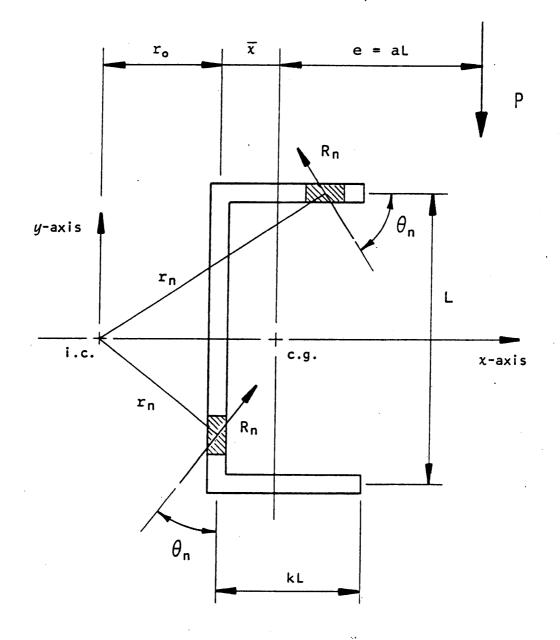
Eccentrically Loaded Weld Group
